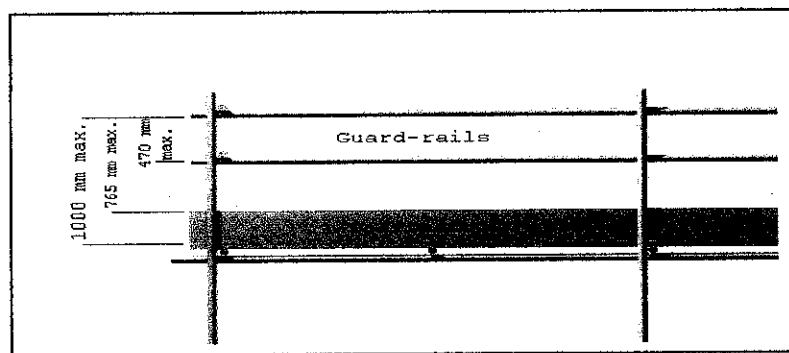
Scaffolding showing required protection of a working platform with maximum dimensions.
